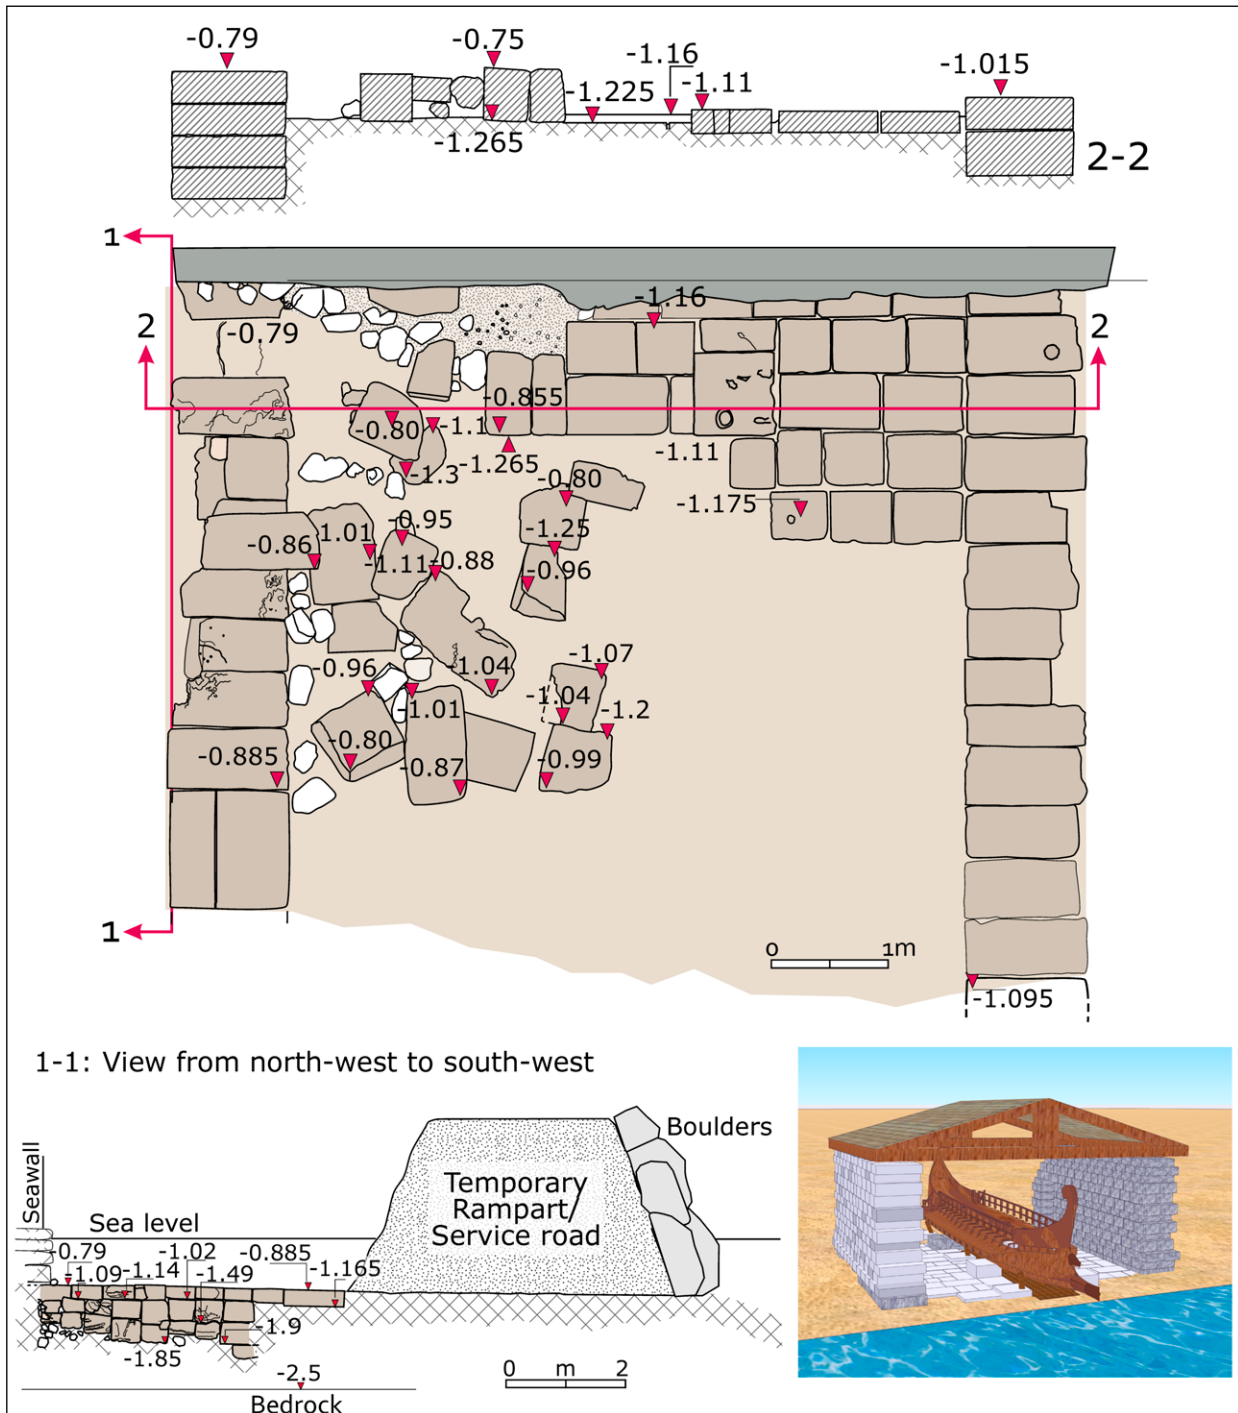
Plan and cross-section of the shipshed, on the lower right a possible reconstruction of the shipshed (Drawing: S. Ben-Yehuda).
